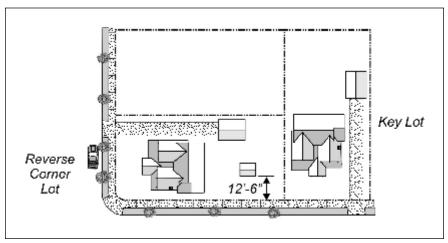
Accessory Structure on Reverse Corner Lot
